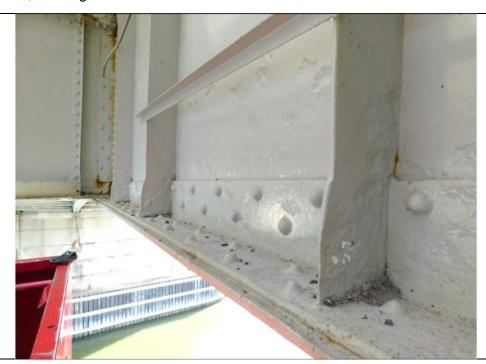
[Span 5, South Leaf] -Girder 2W, east side between FB1s-FB2s, typical section loss and small holes in base of stiffener, Looking Southwest
